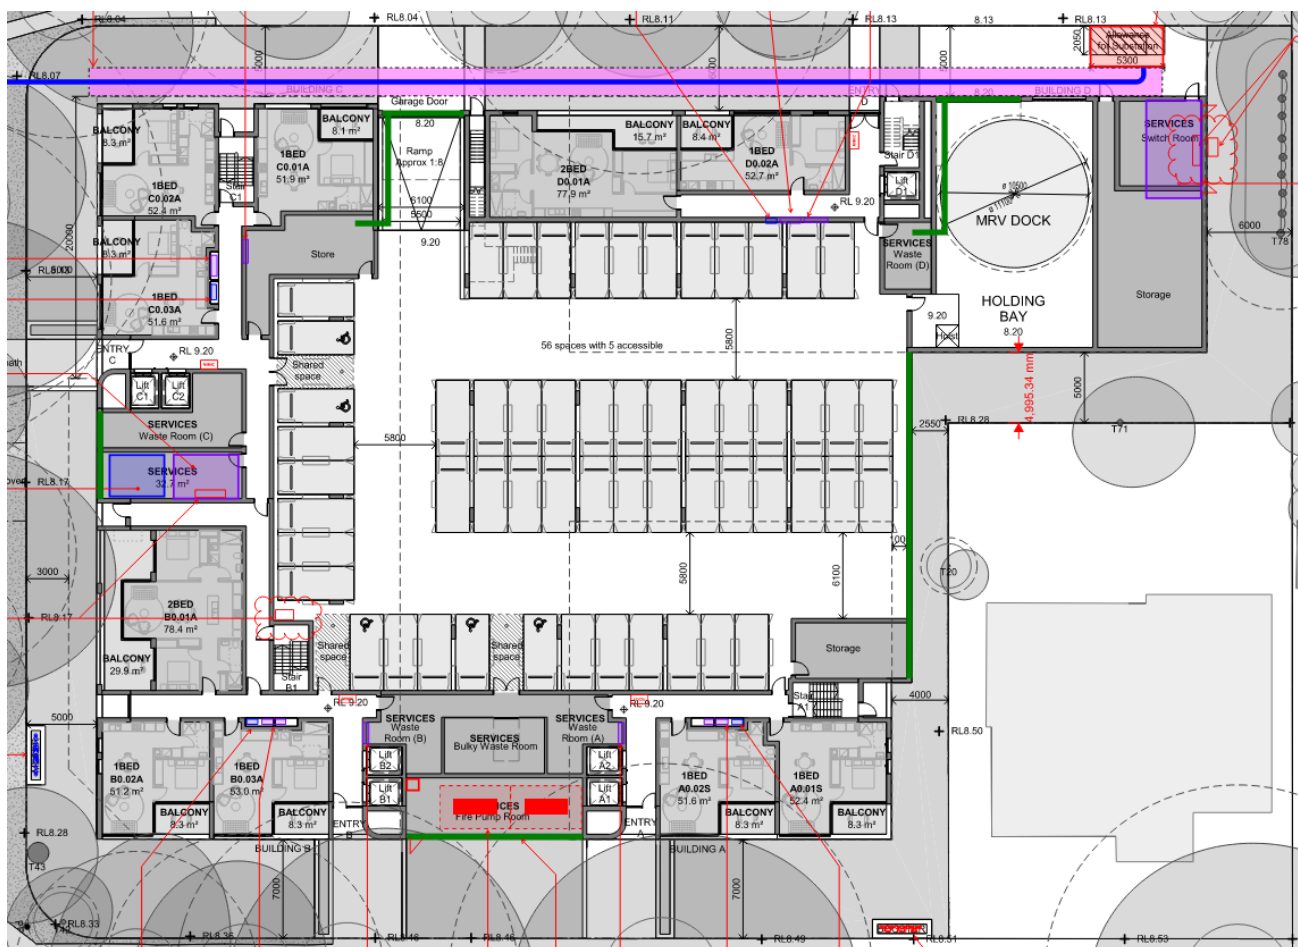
GROUND LEVEL MECHANICAL PLANT, SHOWN CLOUDED
